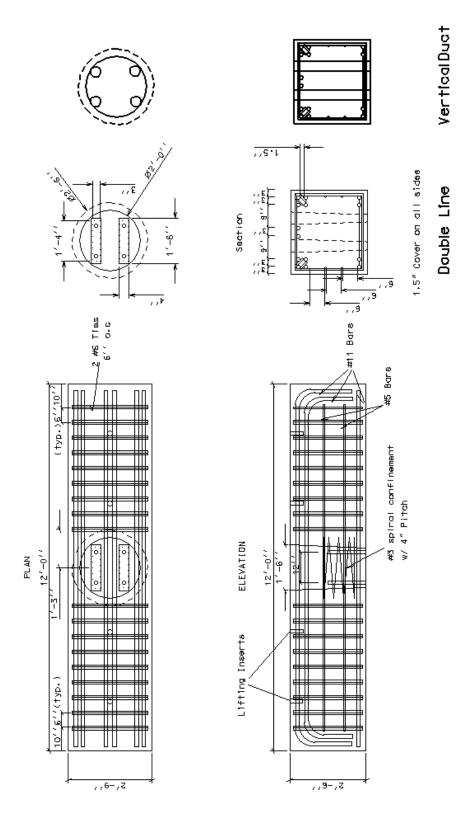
Cast-in-place Bent—Precast Cap Schematic
